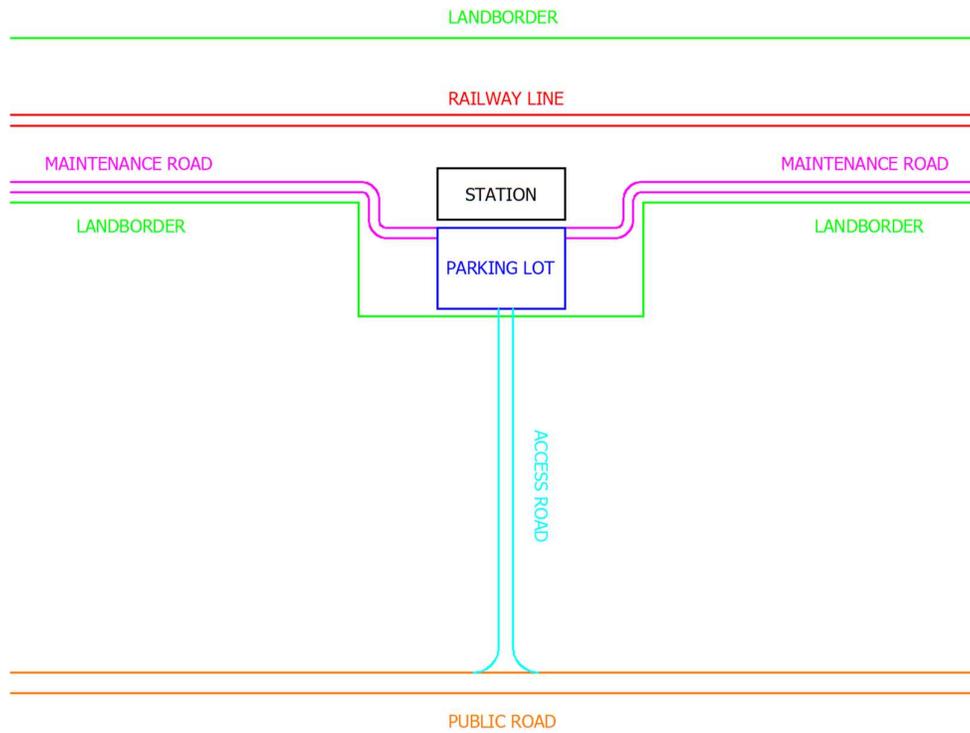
RECOMMENDED PRINCIPAL ROAD SCHEME FOR STATION AND PARKING LOT
